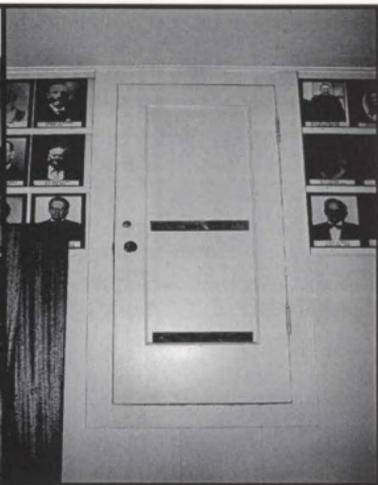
Built-in access door to the attic, Tyler Room, second floor.
